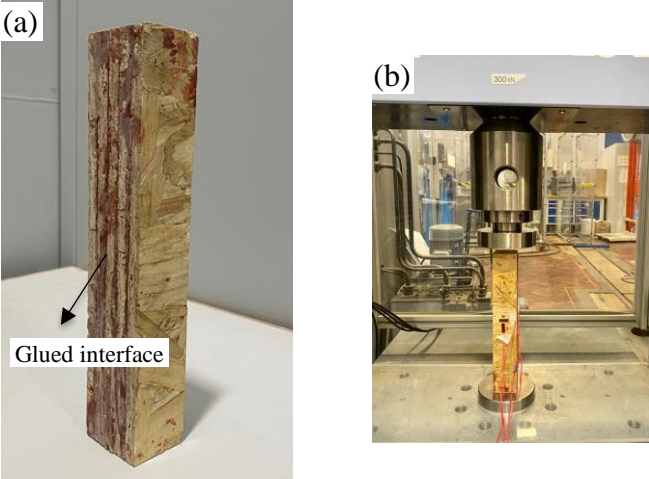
(a) OSB compressive coupons and (b) test set-up
